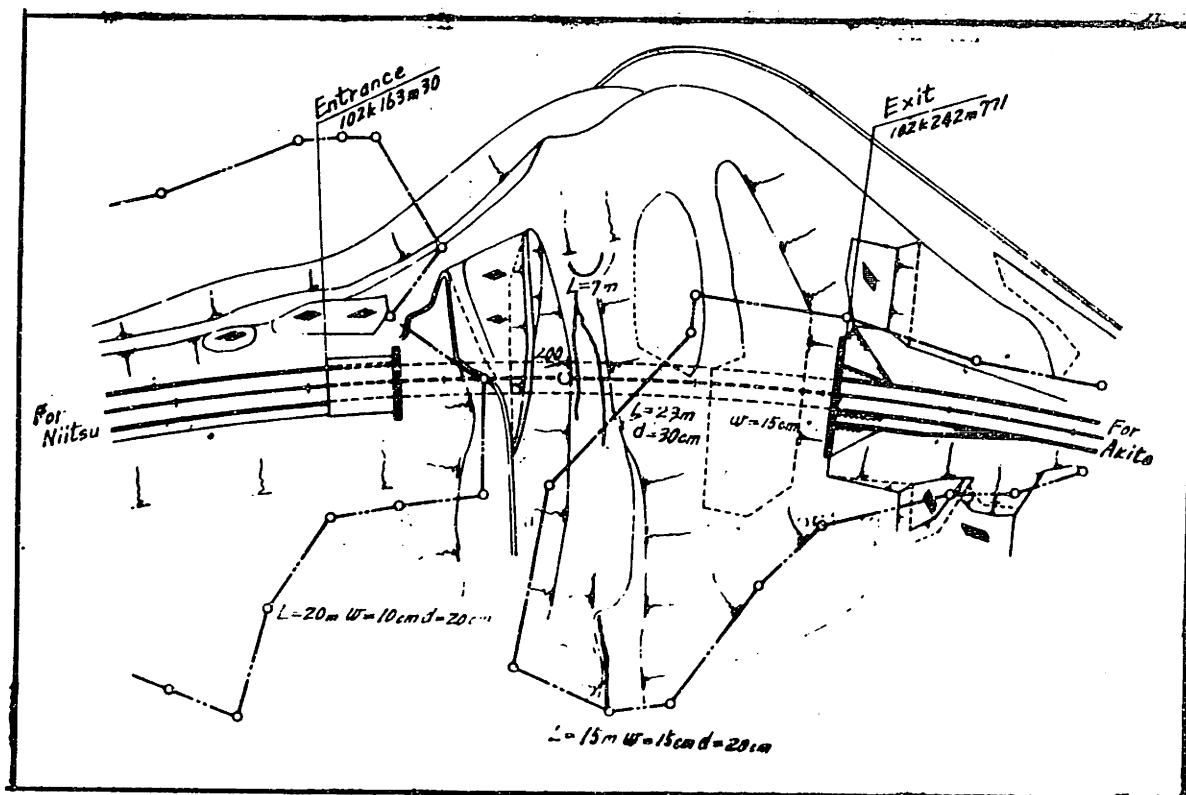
Cracks Found on the Ground Surface Just Above Terasaka Tunnel. (L: length, w: width, d: depth of a crack.) (after Okamoto, 1973)
